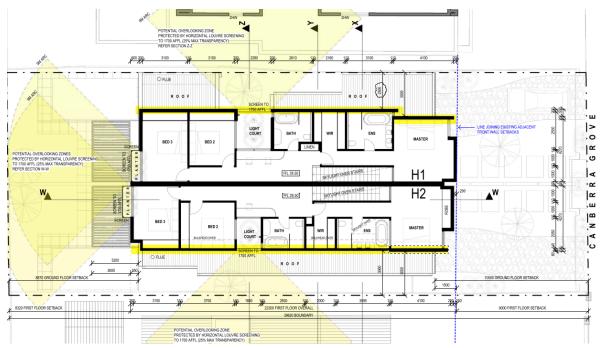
First Floor Plan - Highlighted sections of non-compliant side setbacks
